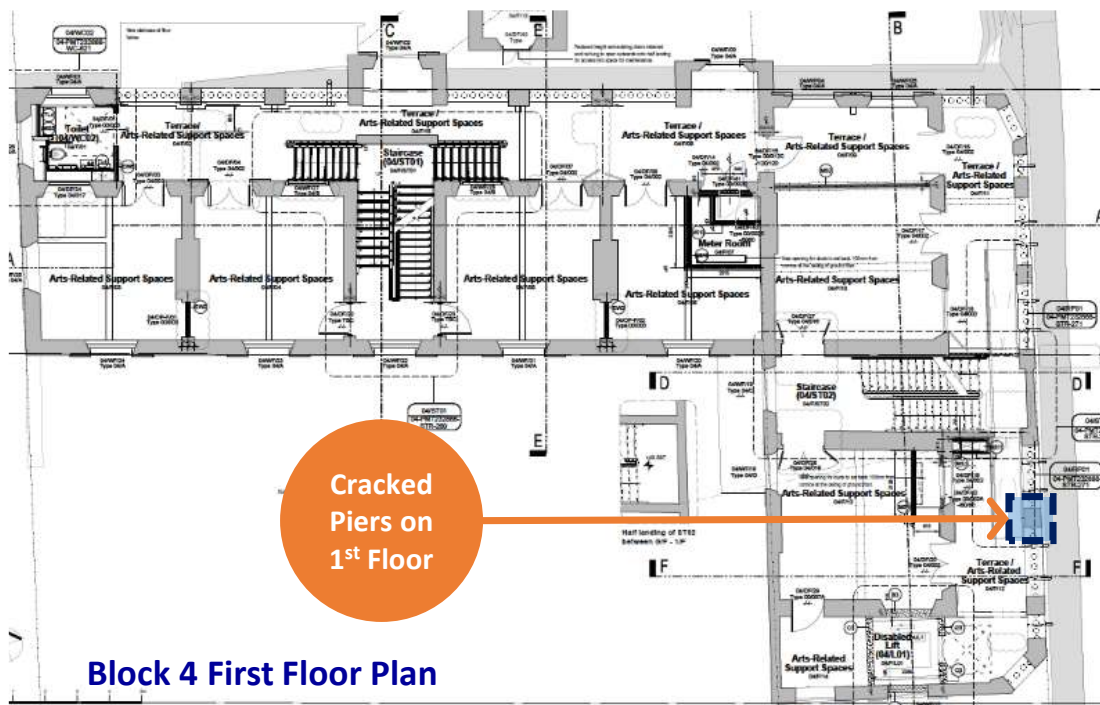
Hidden cracks in brick piers which were revealed after removal of window frames on ground floor and first floor;
